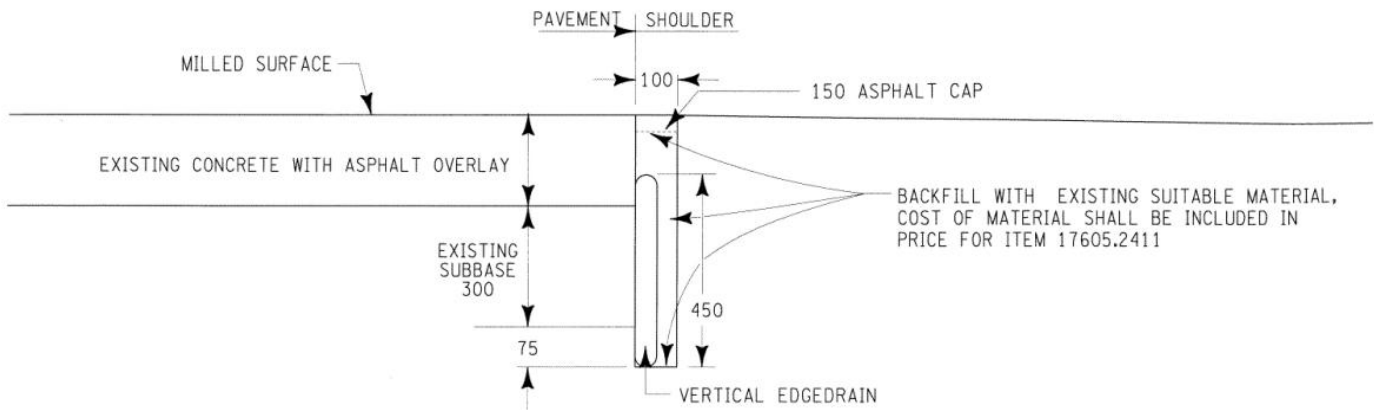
PGED with Existing Suitable Material Detail: Adjacent to Concrete Pavement
